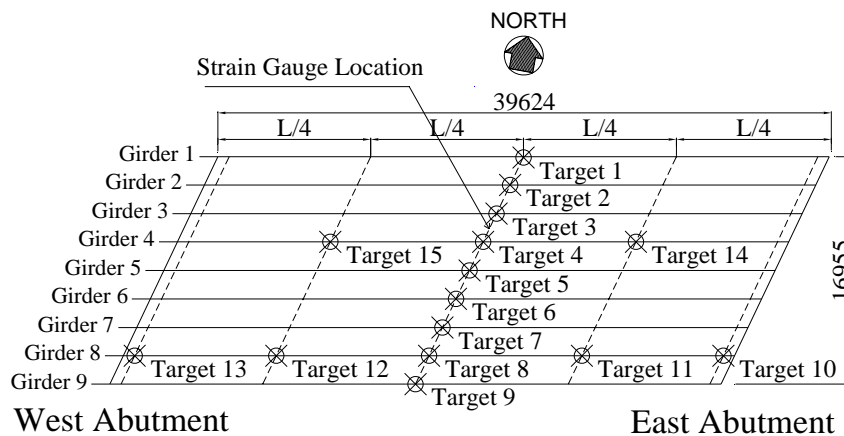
Target Positions of Bridge B-20-149: Plan View (Drawing not in scale)
